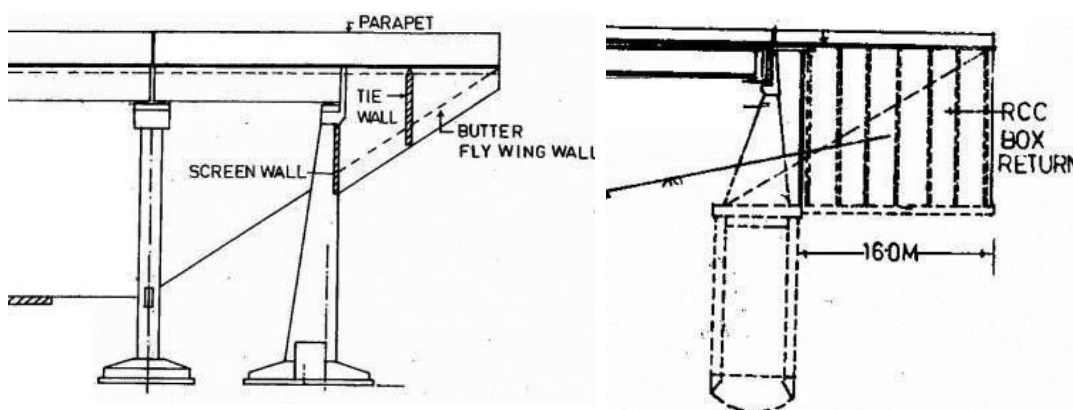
Butterfly Wing Wall and RC Box Return wall details
